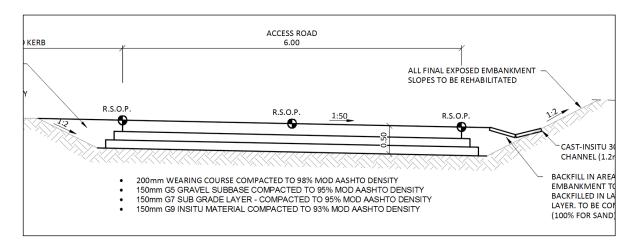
Typical Cross-section Details of Access Roads 1 & 2
